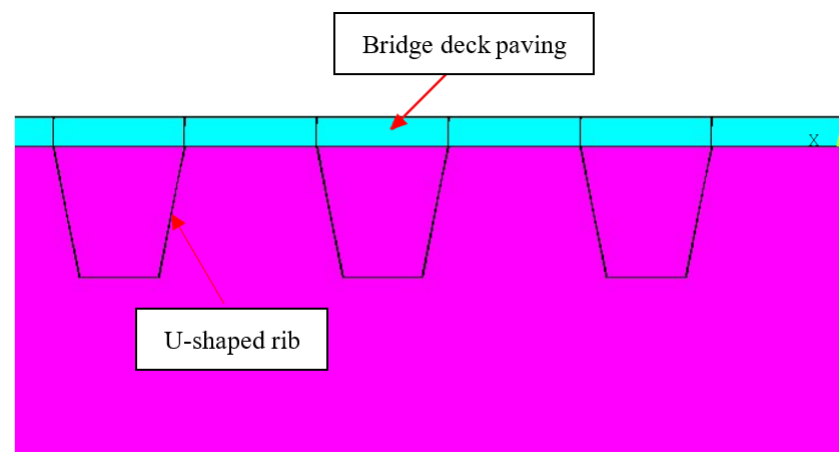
Numerical simulation of composite structure of steel bridge deck pavement.
